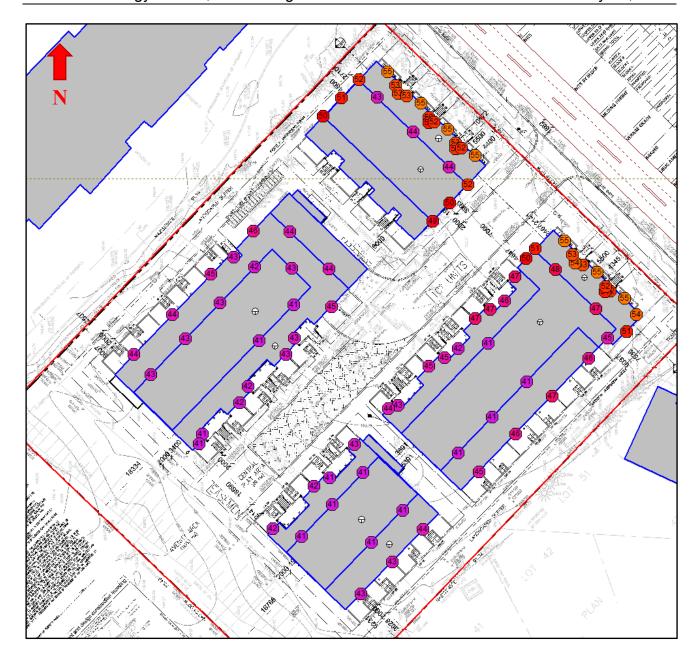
Nighttime Sound Level Predictions at Building Façades from Road Traffic
